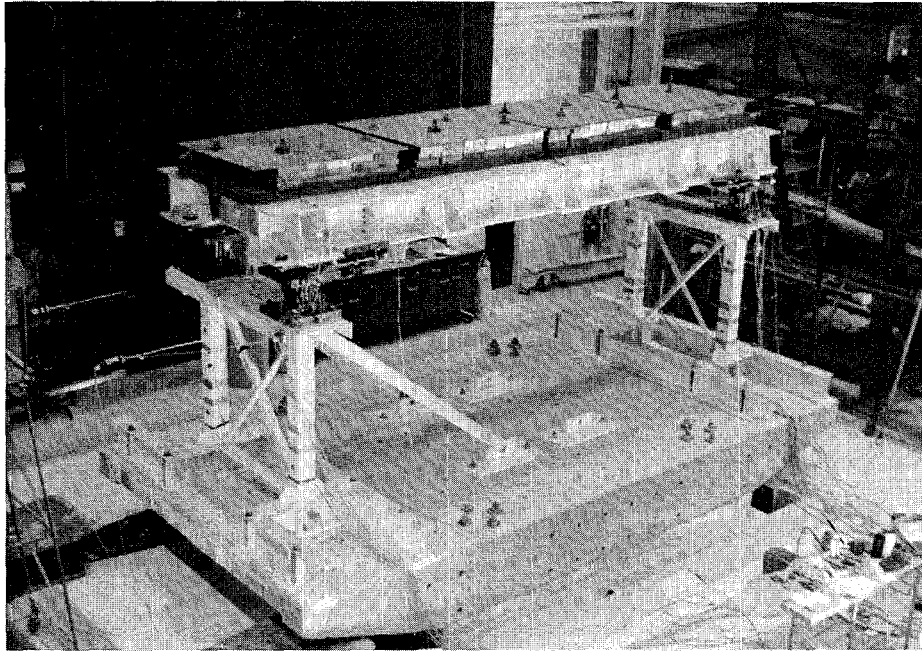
View of Bridge Model with One Flexible Pier and One Stiff Pier.
